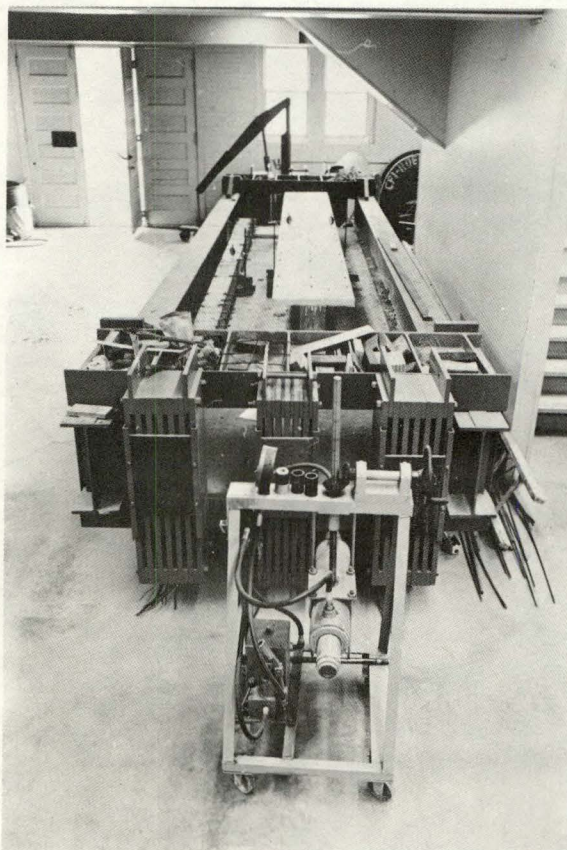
Prestressing bed, jacking equipment and beams stored in bed
